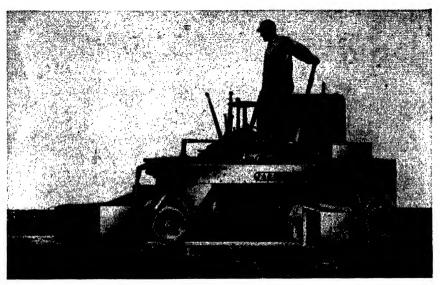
Jaeger diagonal screed finishing machine. (Jaeger Machine Co.)
